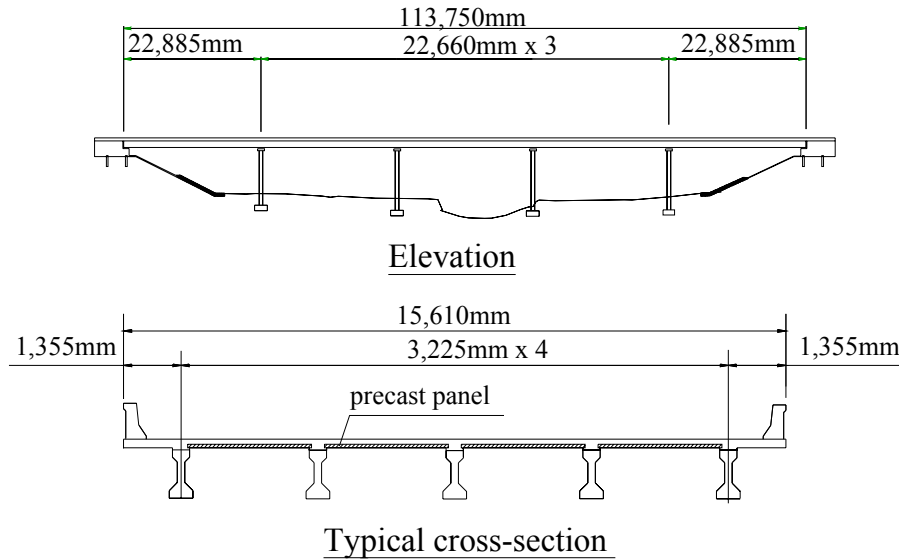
Elevation and Typical Cross-section of Pistol Creek Bridge
